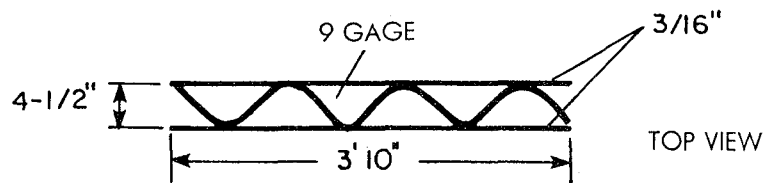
WIRE-MESH REINFORCEMENT IN HORIZONTAL JOINTS (DUR-O-WAL)
